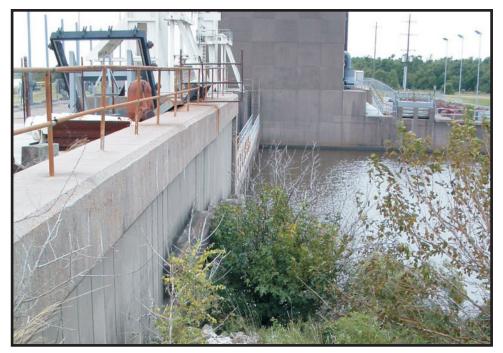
View of PS 16 from east bank of Alligator Bayou, facing west
